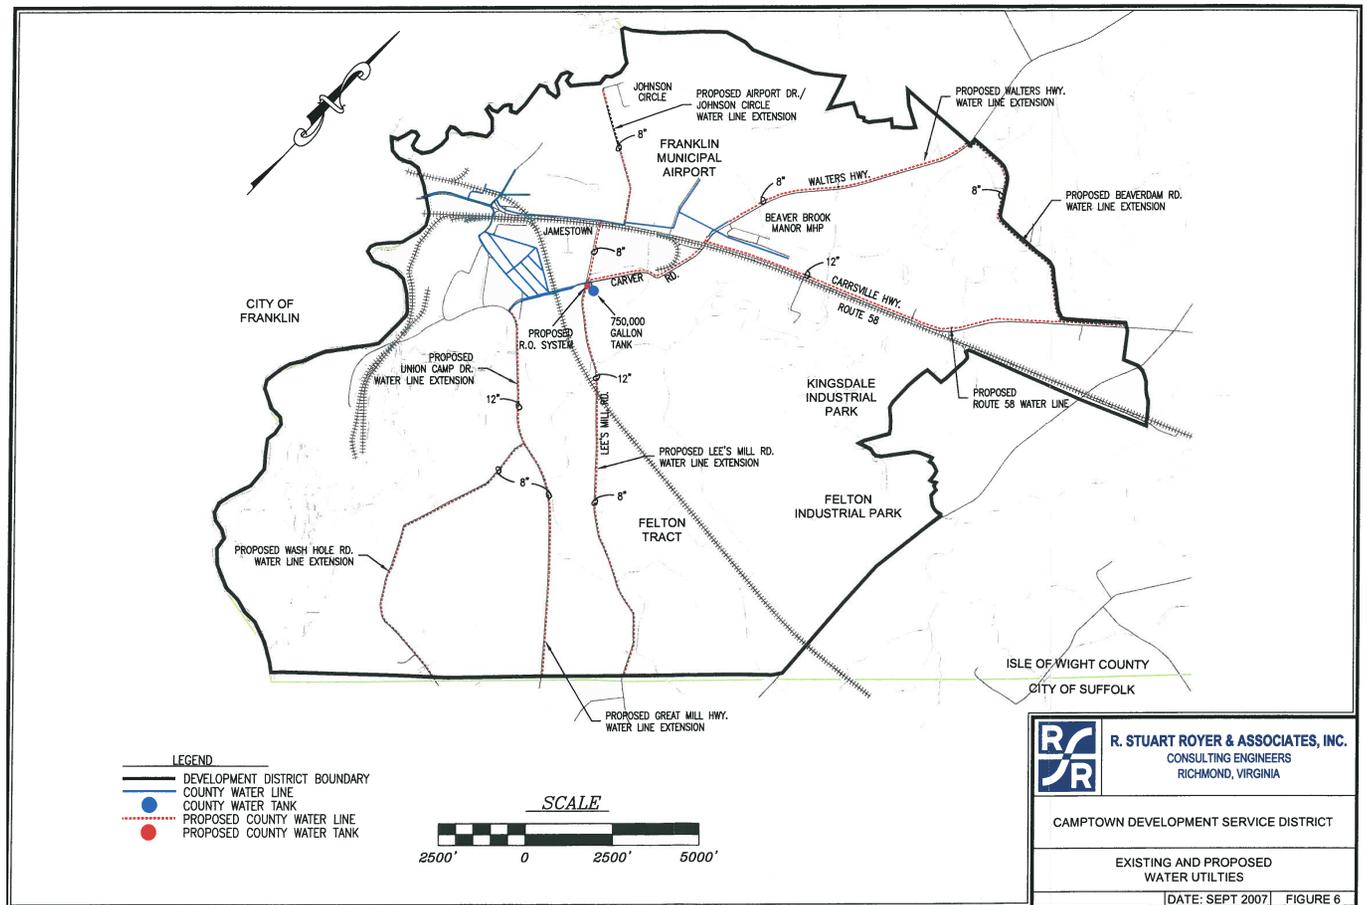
Proposed Water Plan Camptown DSD from the Master Sewer and Water Plan, adopted 2008.
